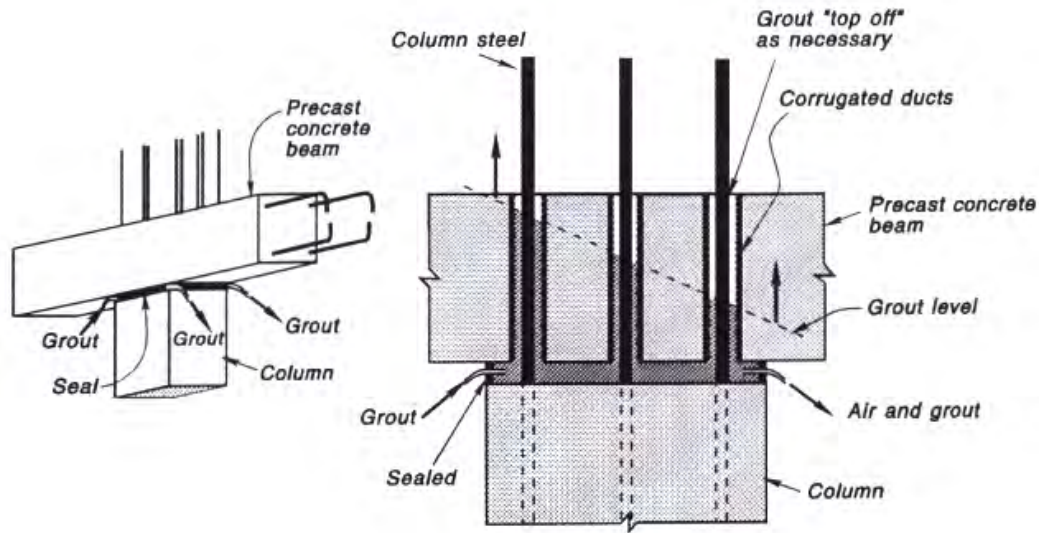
Precast Beam-Column Connections Used in New Zealand (Restrepo et al. 1993)
